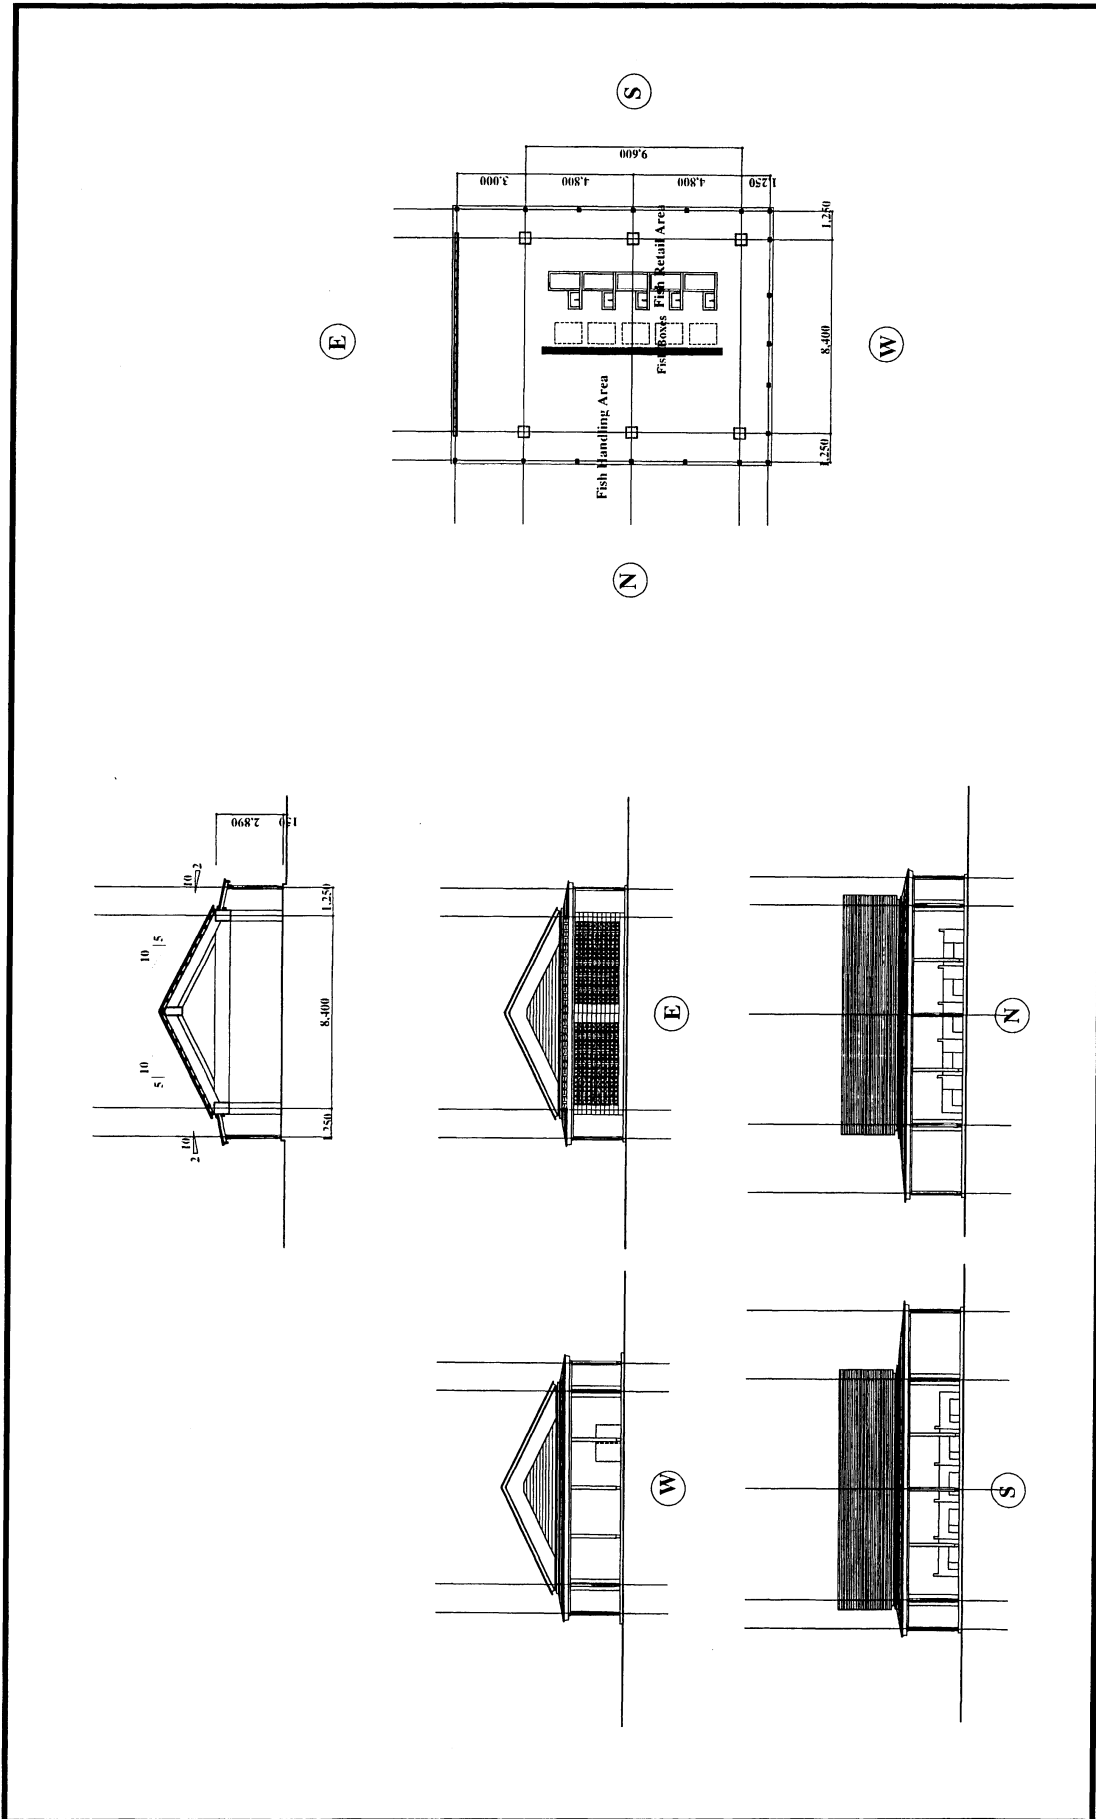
Plan / Section of Fish Retail Shop
